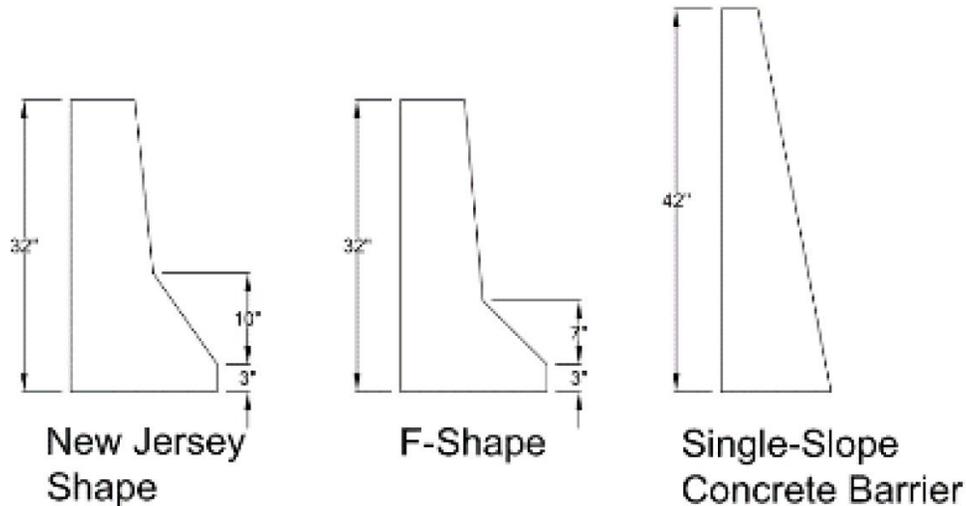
Commonly used concrete bridge barrier profile shapes [68].
